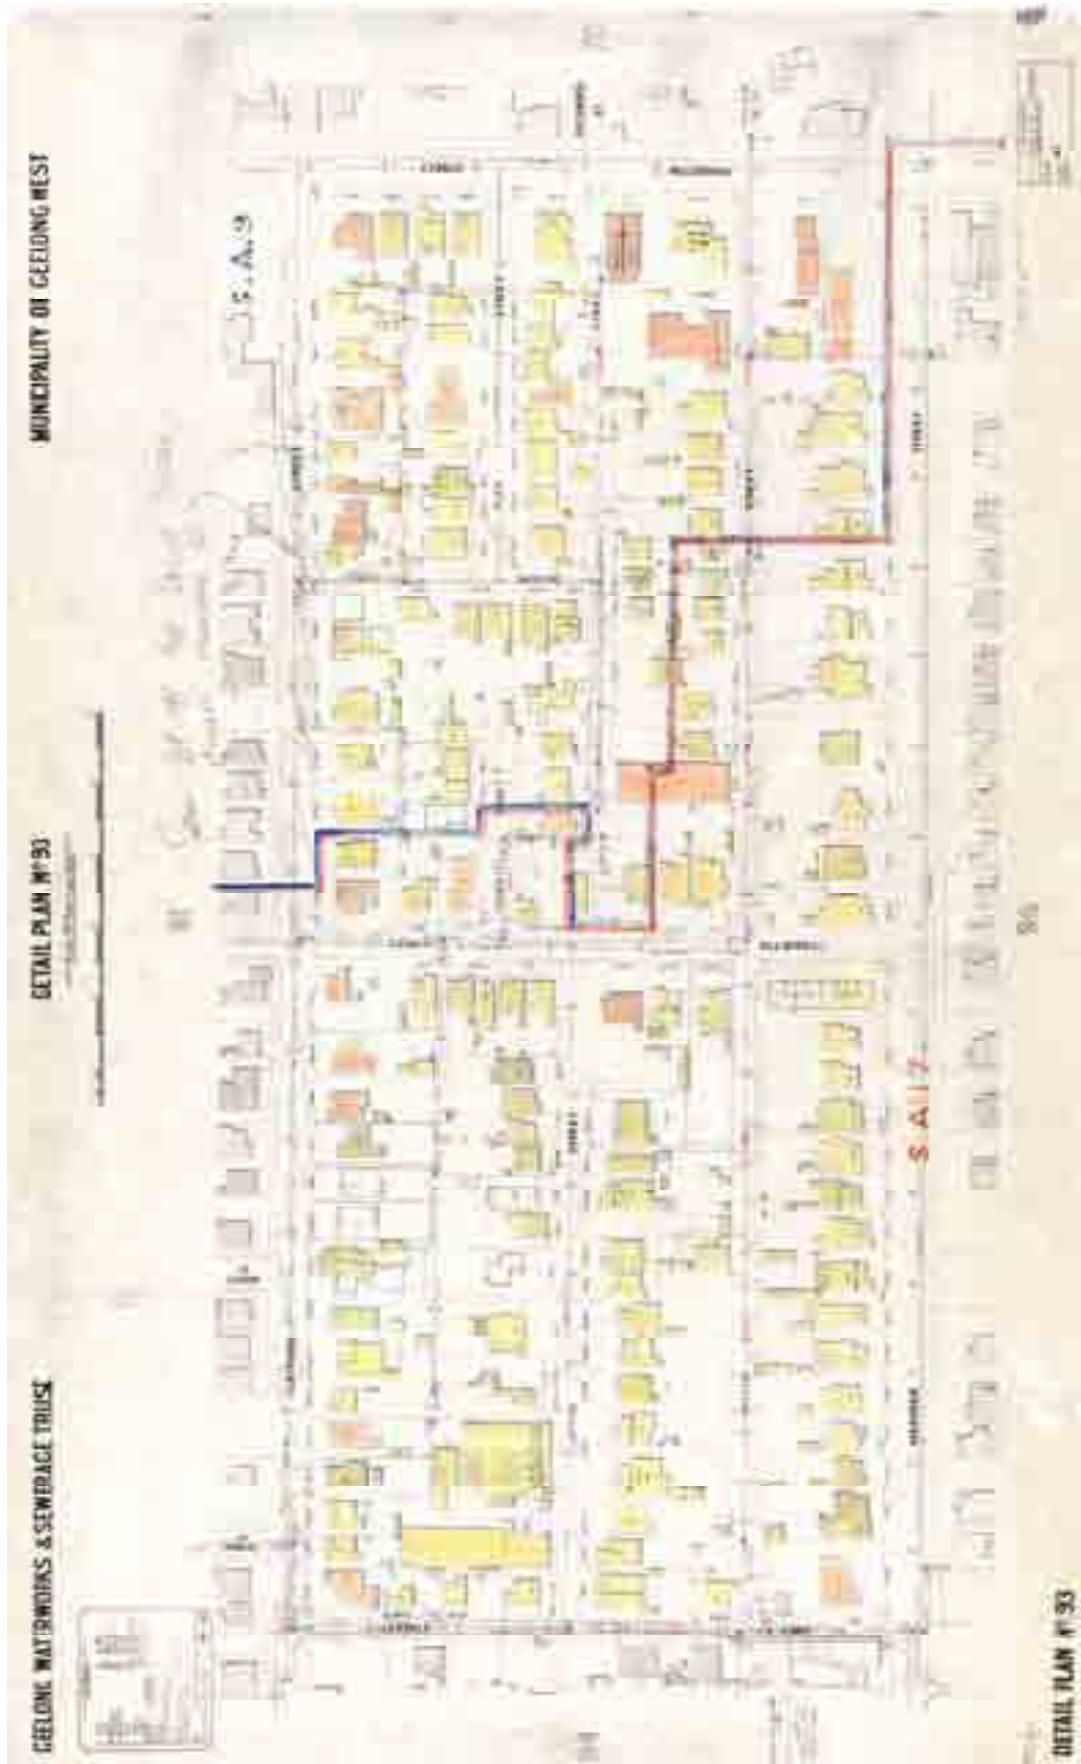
Geelong Waterworks & Sewerage Trust Detail Plan No. 93 showing Pineville Precinct (south of Gertrude Street), c.1912 (revised 1914, 1917 & 1970). Source: Barwon Water.
